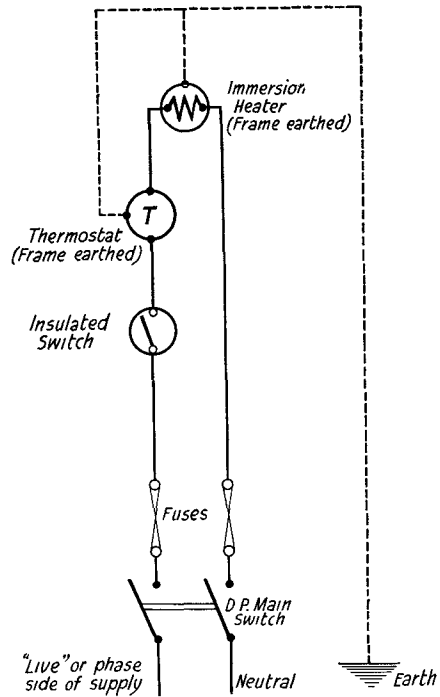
THE WIRING FOR A TYPICAL IMMERSION HEATER INSTALLATION.
